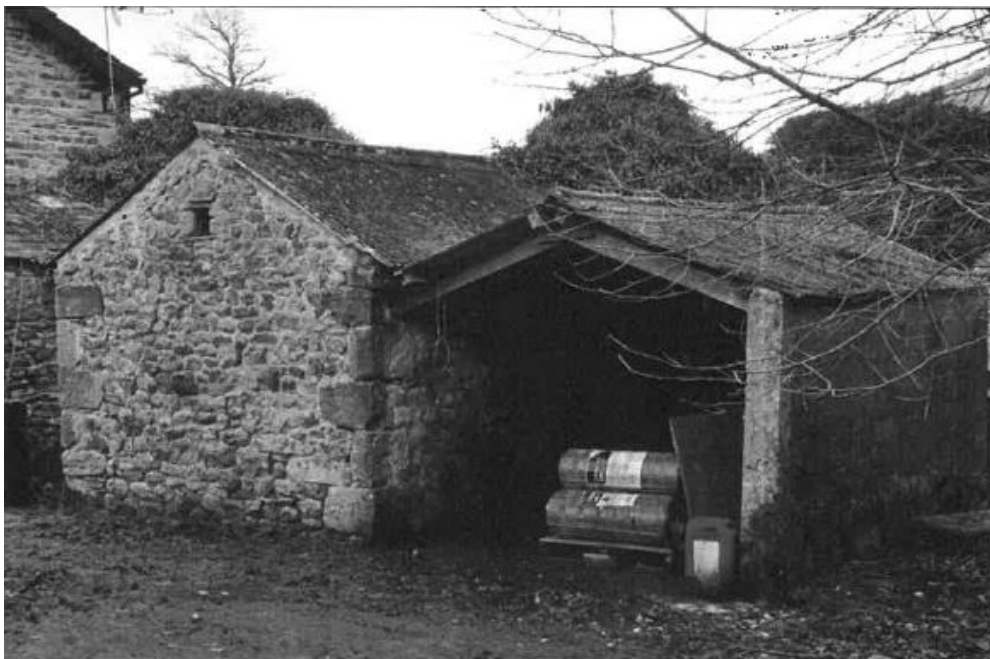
NORTH ELEVATION OF OUTBUILDING 2 & MODERN CONCRETE SHED WITH ASBESTOS CEMENT ROOFING
